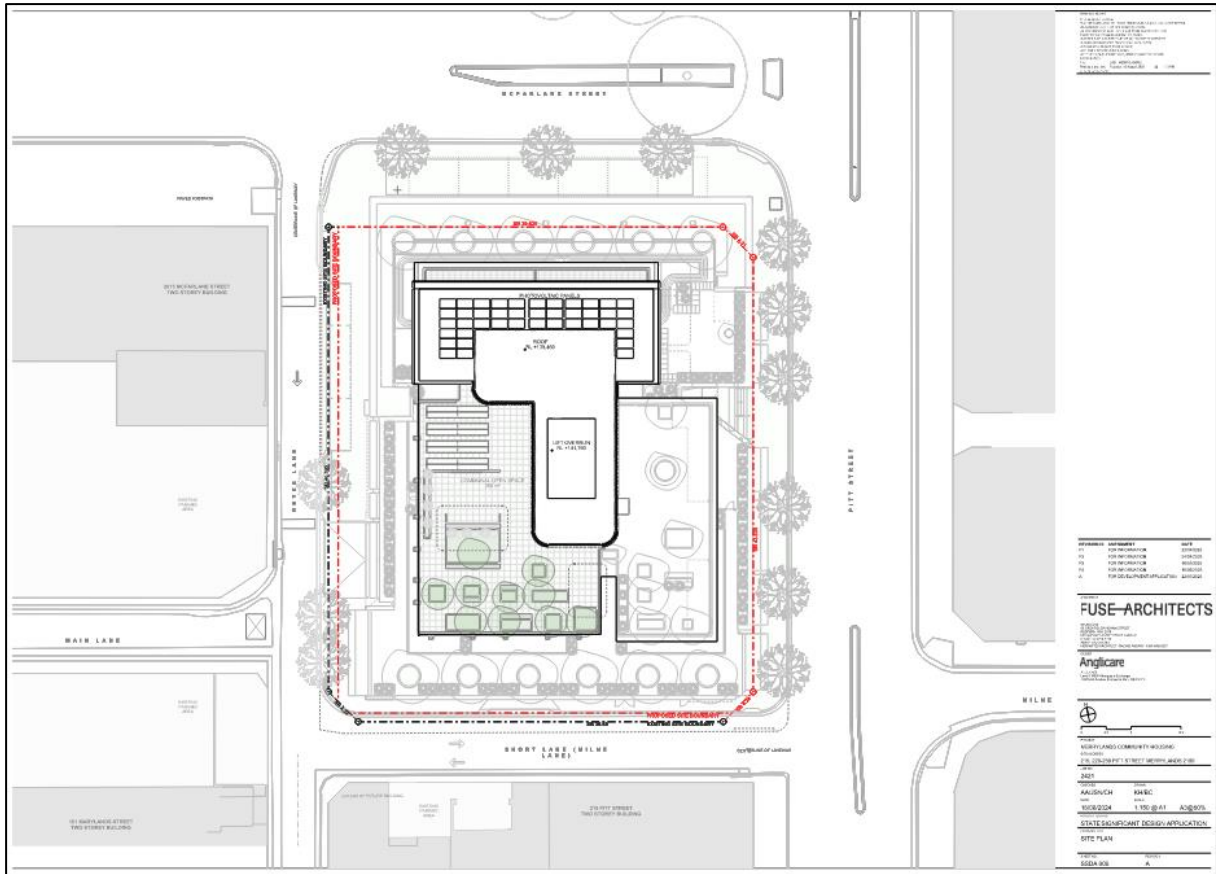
Proposed Development Site Plan (Source: Fuse Architects, Sheet SSDA 005, Rev. A, 22 July 2025)
